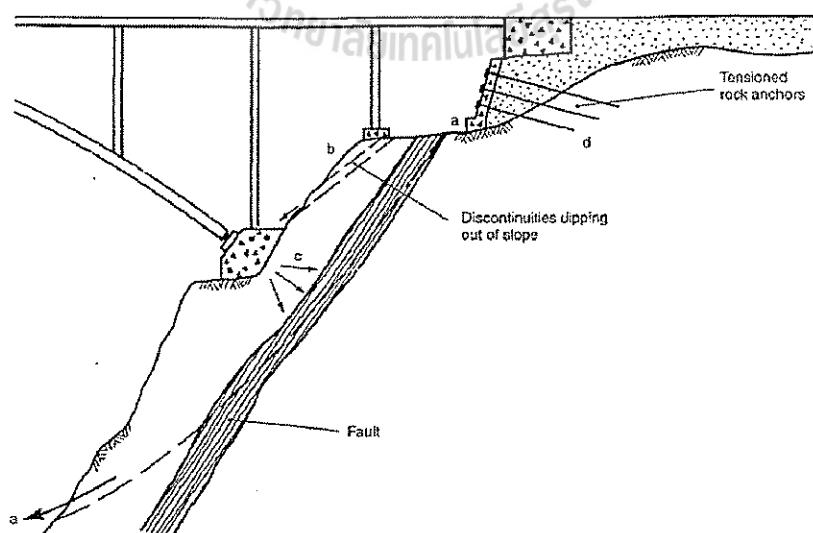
Stability of bridge abutment founded on rock: (a-a) overall failure of abutment on steeply dipping fault zone; (b) shear failure of foundation on daylighting joints; (c) movement of arch foundation due to compression of low-modulus rock; and (d) tied-back wall to support weak rock in abutment foundation.
